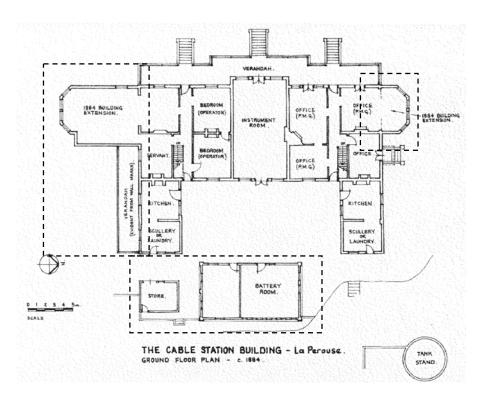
Ground floor plan of Cable Station building following early alterations (from Danis et al.: 164).
